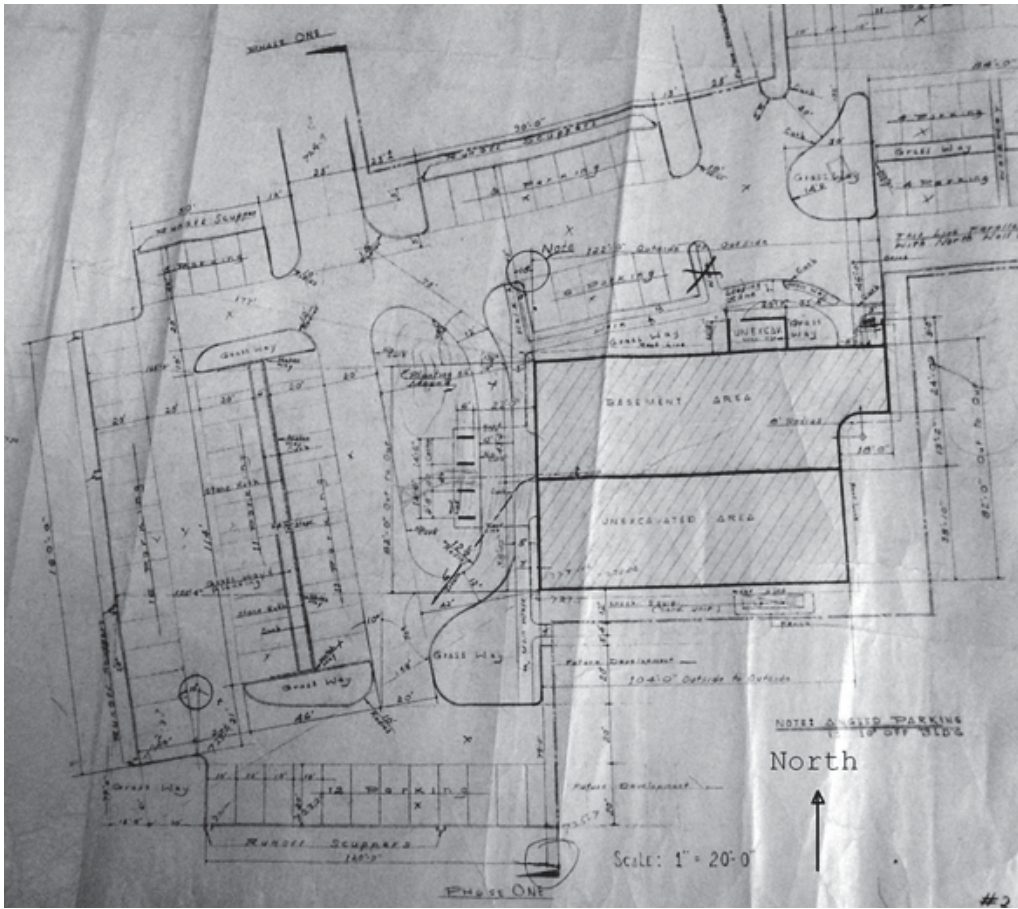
Original supper club and parking plan, 1966 (Building plans)
